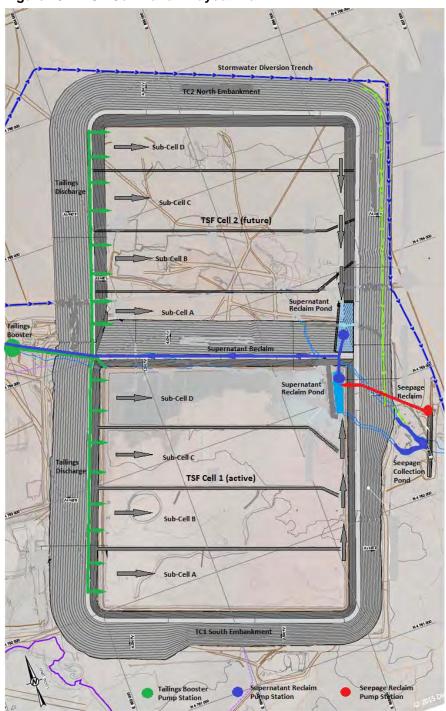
TSF Cell 1 and 2 Layout Plan
